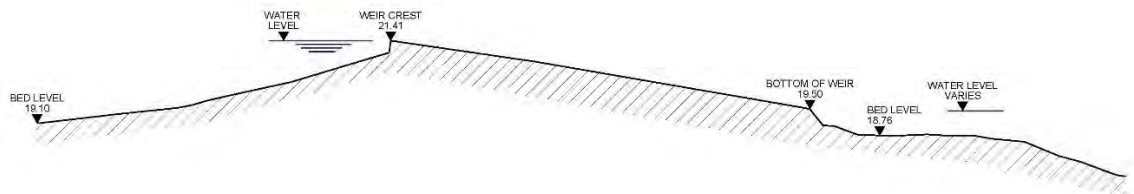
Typical Cross Section Through Crump (embankment) Weir at Fermoy
